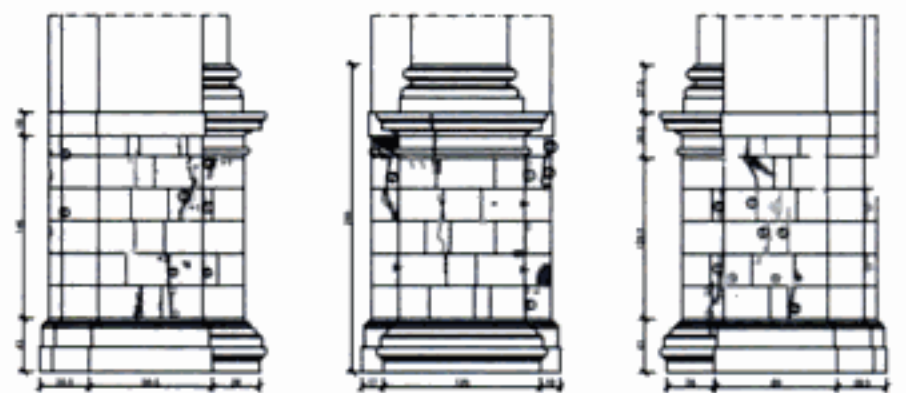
Typical crack pattern of a pillar under heavy compressive stresses.
